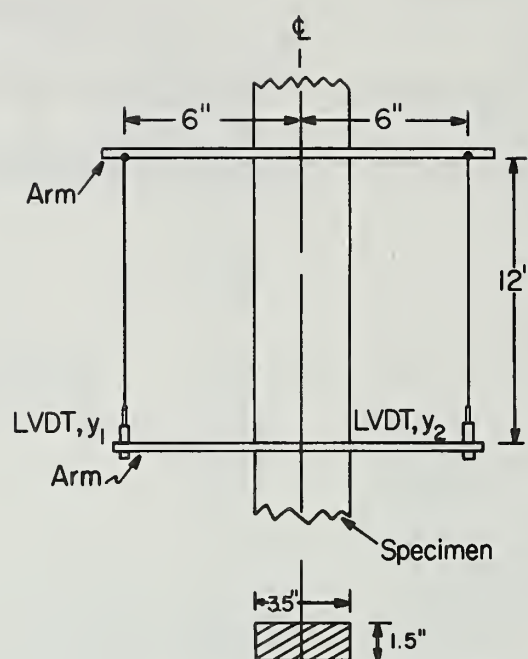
Deflectometer arrangement used in eccentric axial load test. Rigid arms were clamped to specimen and linear variable differential transformers (LVDT's) were mounted between them 6 inches from center on either side (ML845431).
